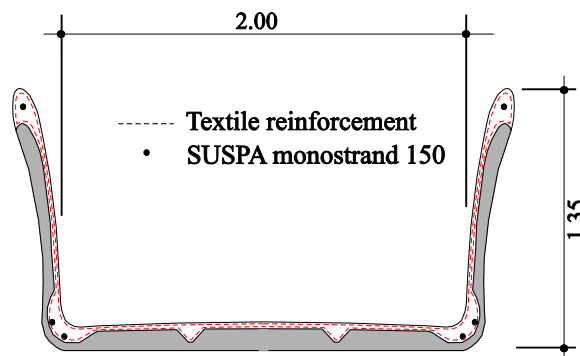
Cross-section of the Kempton Bridge [Michler 2013]
